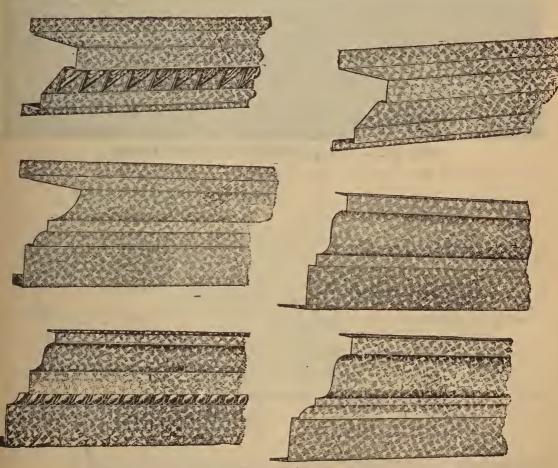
Sheet Metal Moulds for Belts, Cornices, etc.
